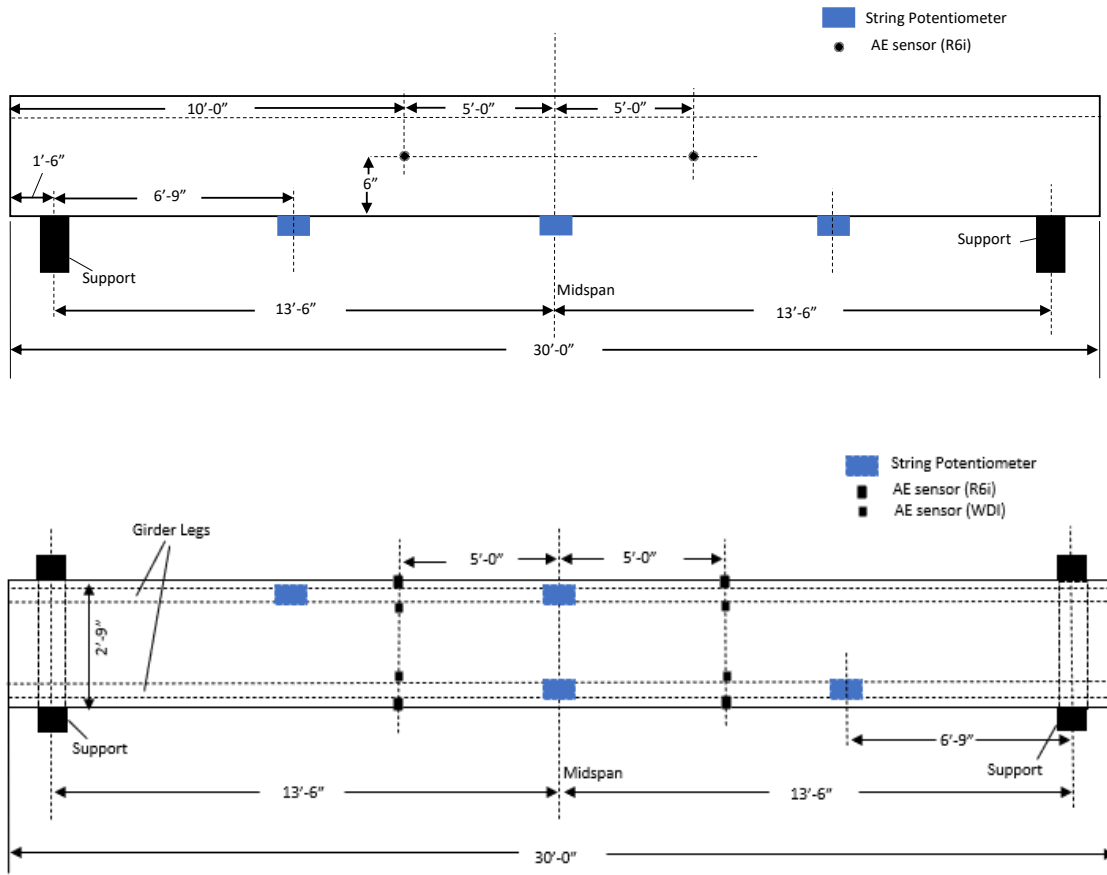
Elevation (top) and plan (bottom) instrumentation layout
